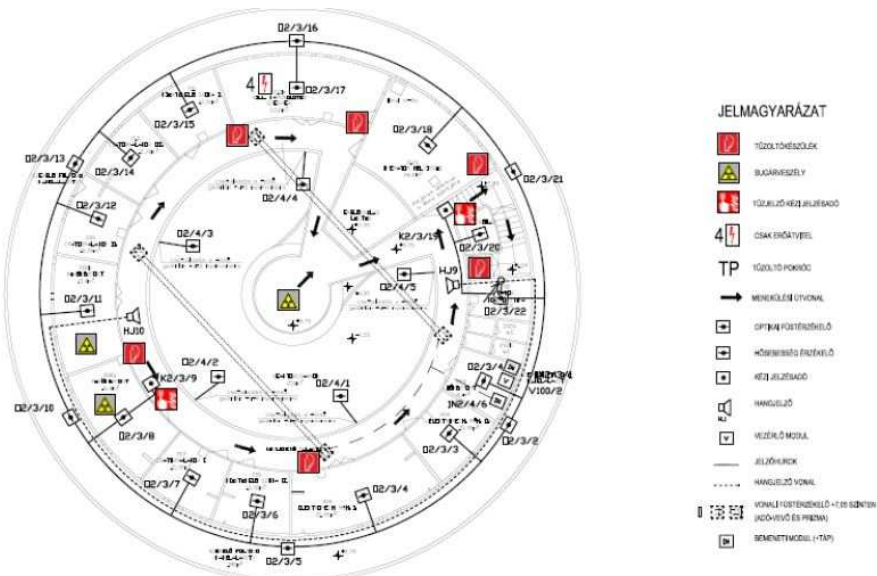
Location of fire alarm and fire suppression equipment in the upper floor
